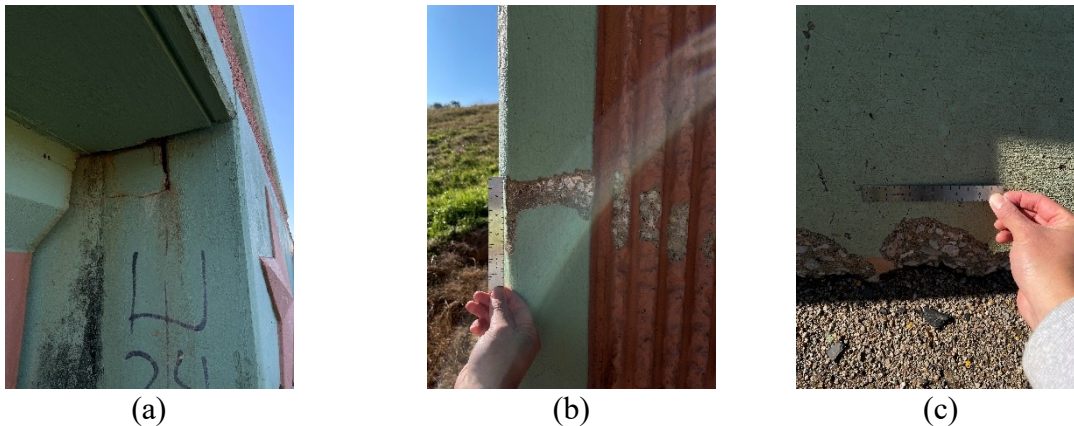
Deteriorations on the Bridge: (a) Crack at Abutment Wall; (b) Spalling at Abutment Wall; (c) Spalling at Concrete Rail
